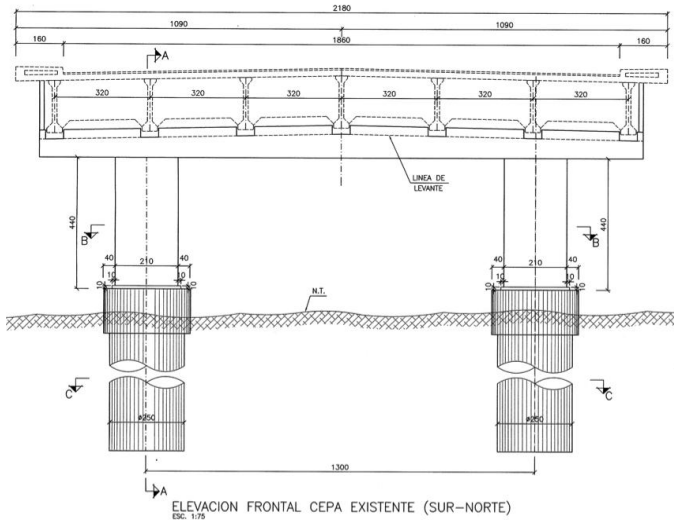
Elevation view of a pier at Juan Pablo II Bridge (dimensions in cm).
